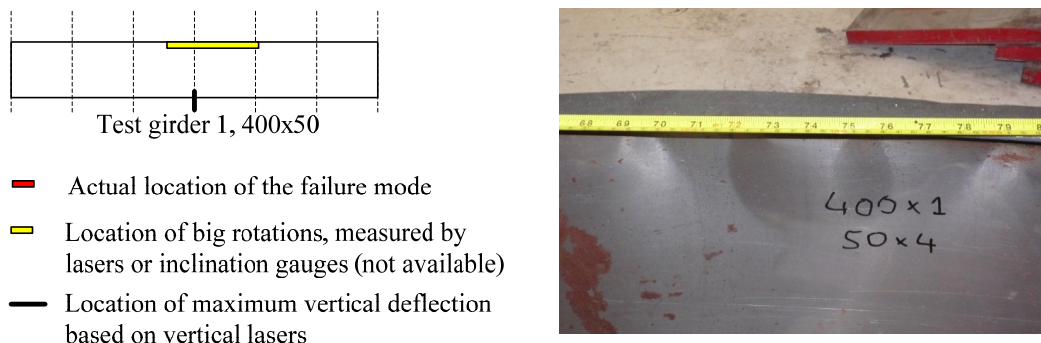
Location of final failure mode of test girder 1, 400x50
